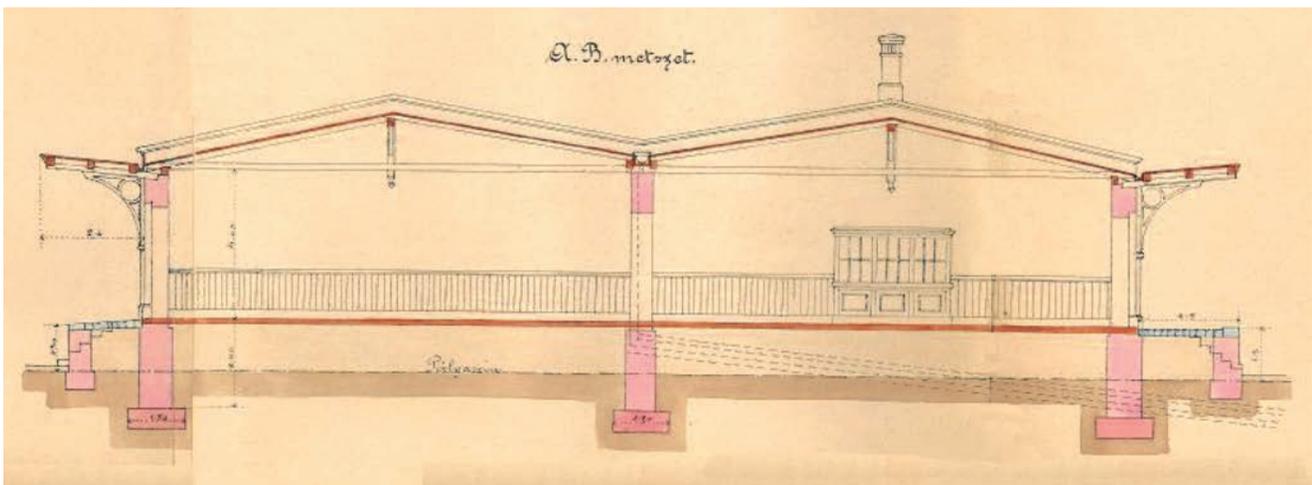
Railway warehouse 3, 1881, transverse section through storage part [5]
